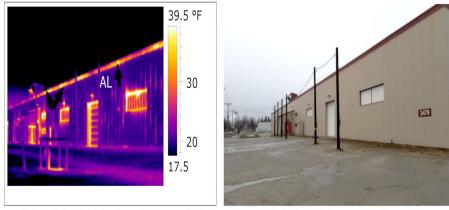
Building 3 Air Leakage Pathways @+25Pa Image 9-2. Building 3 Storage Facility and Shop
